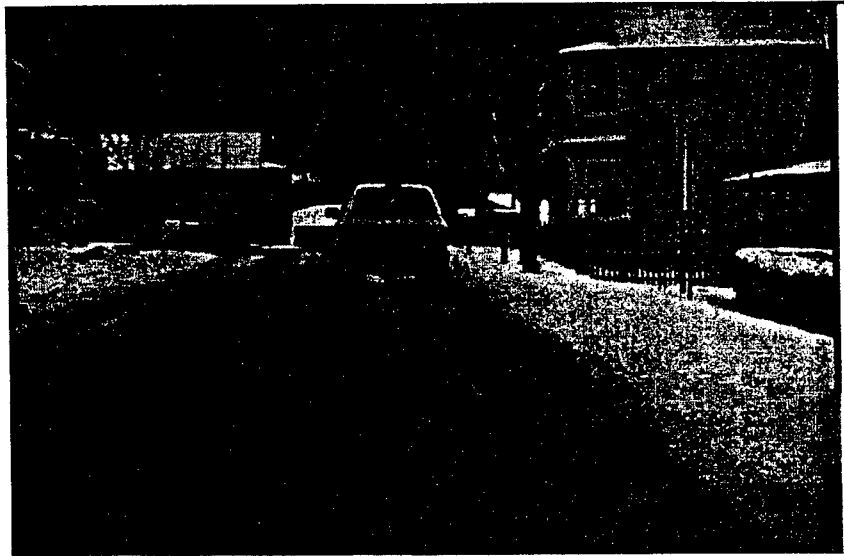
Driver's Eye View of Slush on Richwood Avenue Test Section in Morgantown.
